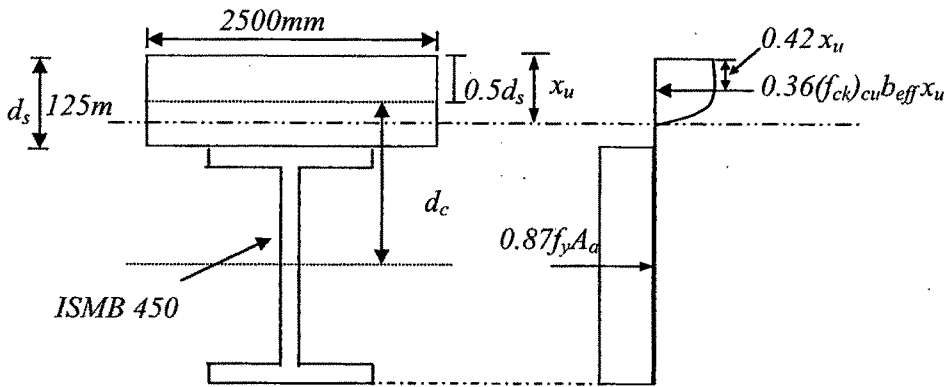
Cross Section of Composite Beam with Stress Diagram
